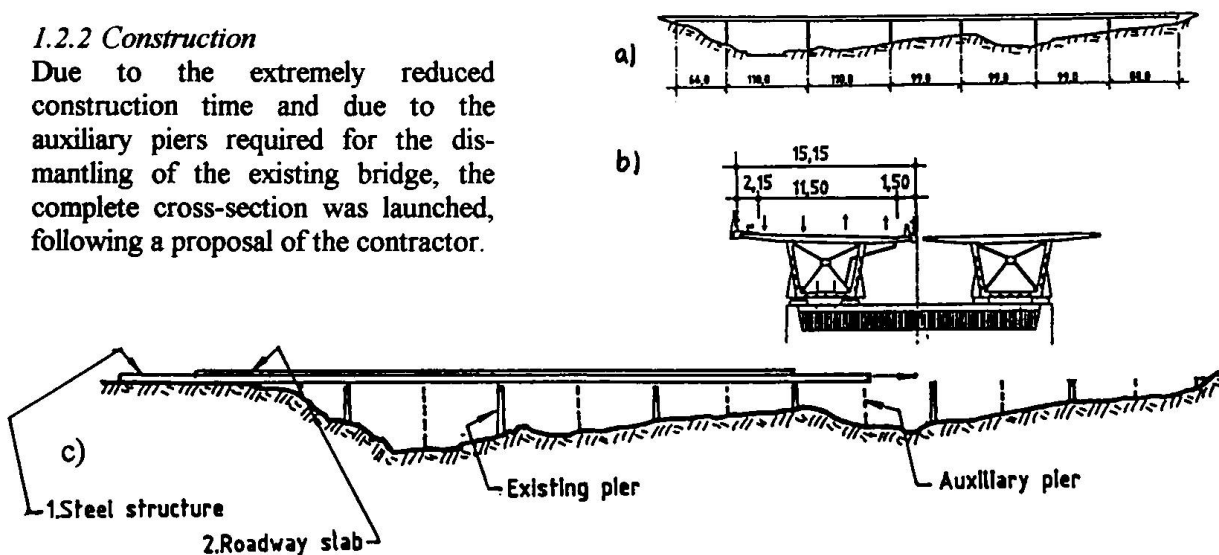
Highway bridge at Wilkau-Haßlau, Germany:
